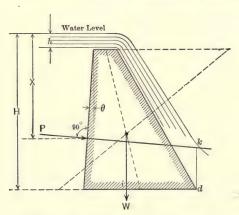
Cross-section of Gravity Dam (Water overflowing).
